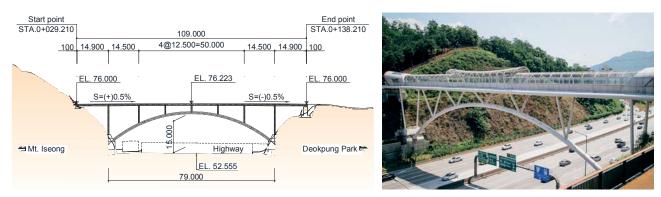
Wirye bridge, a) Longitudinal section, b) Completed structure
